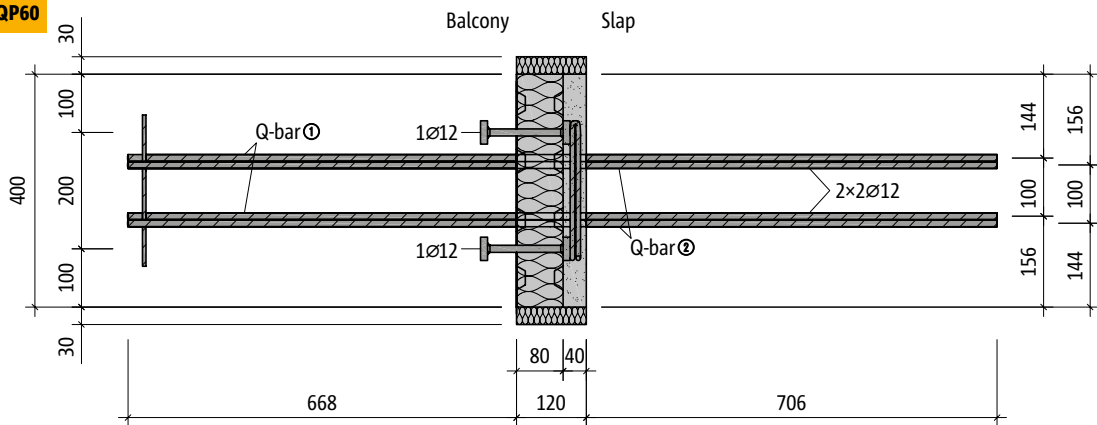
Plan view: Schöck Isokorb® type RQP60+RQP60
